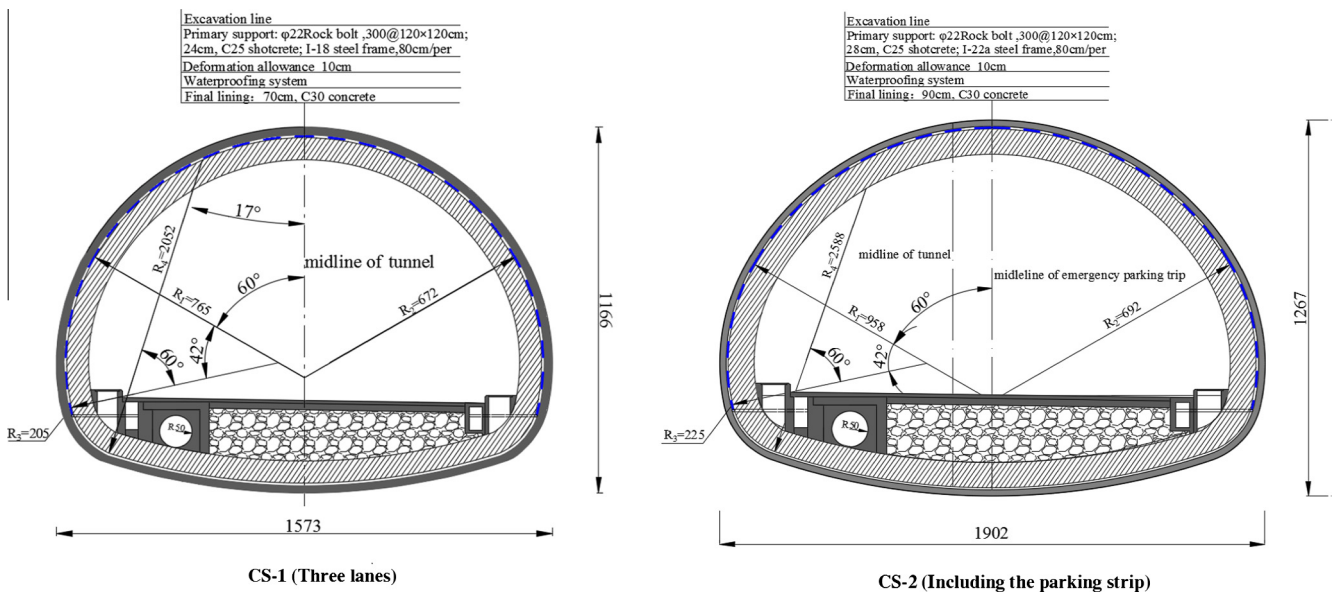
Cross section of Shuangbei tunnel (Grade IV, unit: cm).
